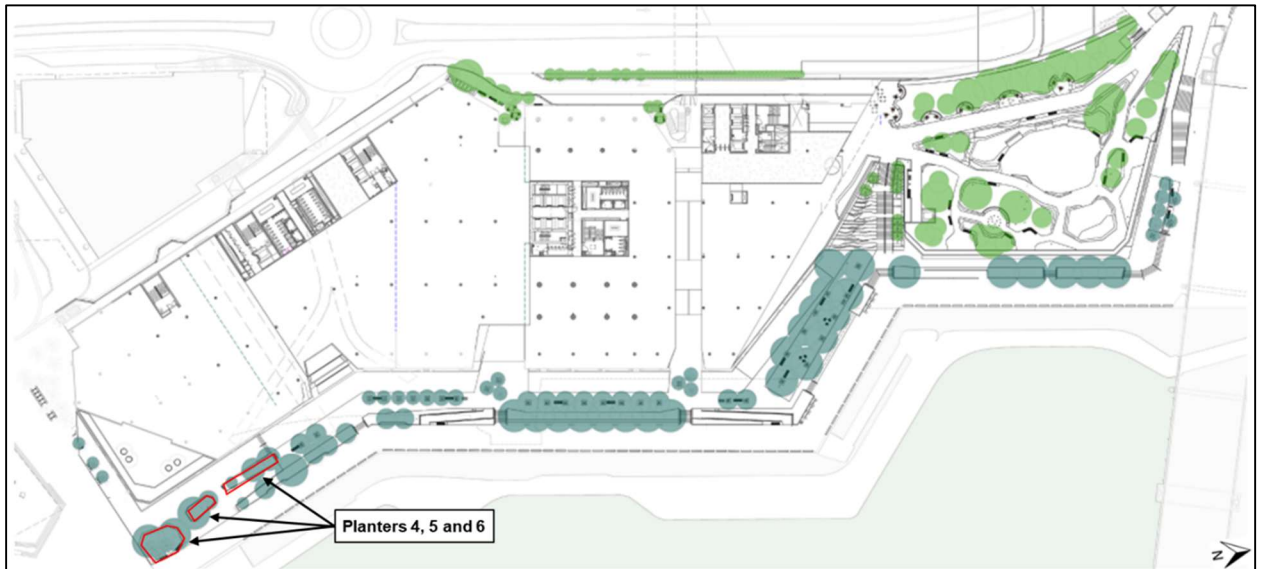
| Proposed tree planting on the site (Source: Applicant's RtS)
